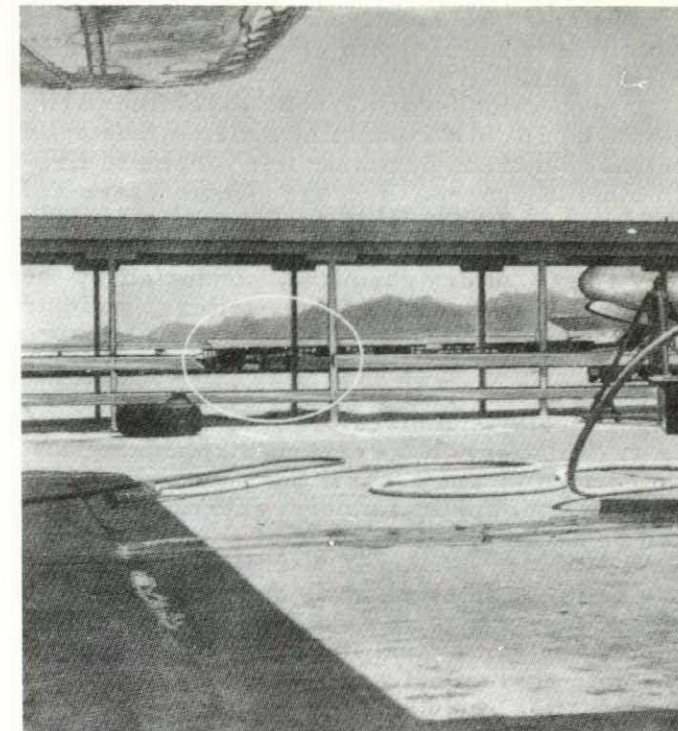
(a) — Ramp Railing Damage Caused by Exploding Landing Gear Wheel
